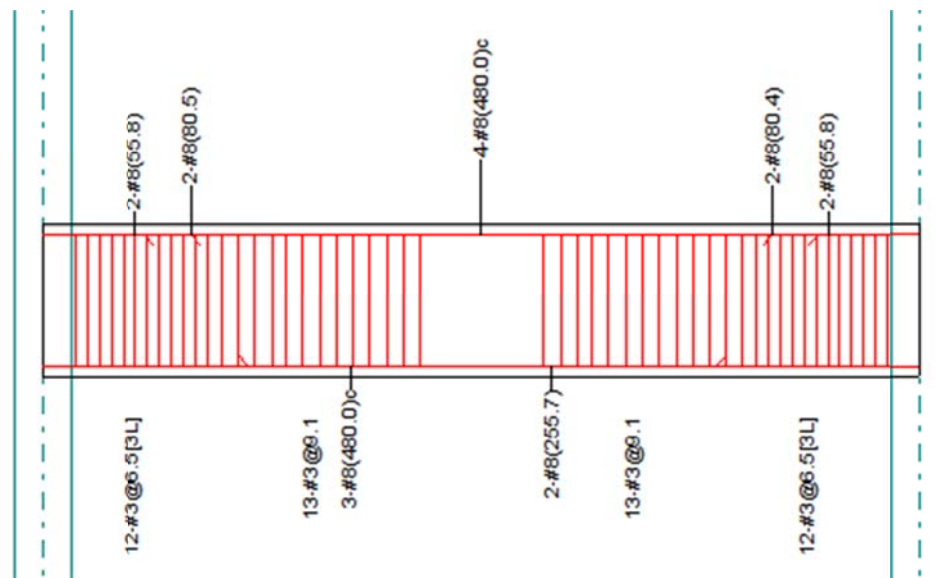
spBeam Column Line B.1 Reinforcing Diagram (Lateral Loads)
